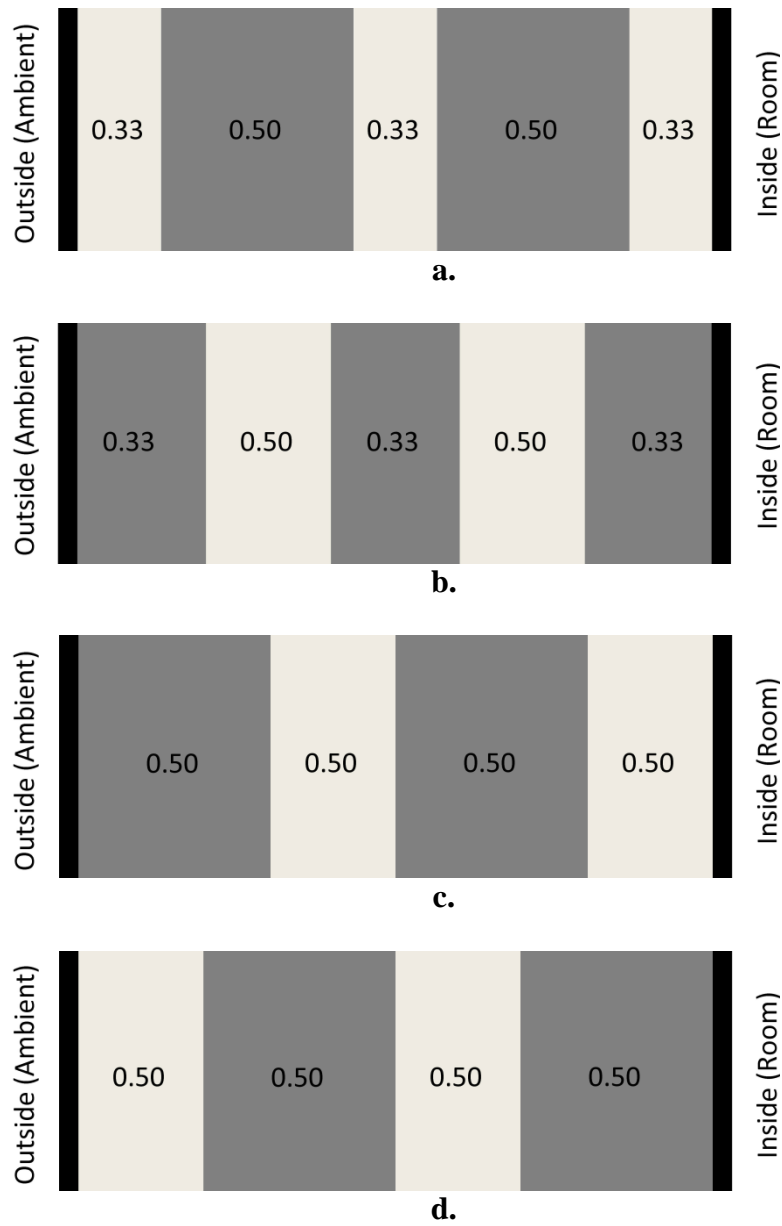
Four Wall Configurations: (a) Wall 0, (b) Wall 1, (c) Wall 2, (d) Wall 3. The shading represents material (light grey = insulation, dark grey = concrete), and the numbers represent percentage of that component (insulation or concrete) in each layer.
